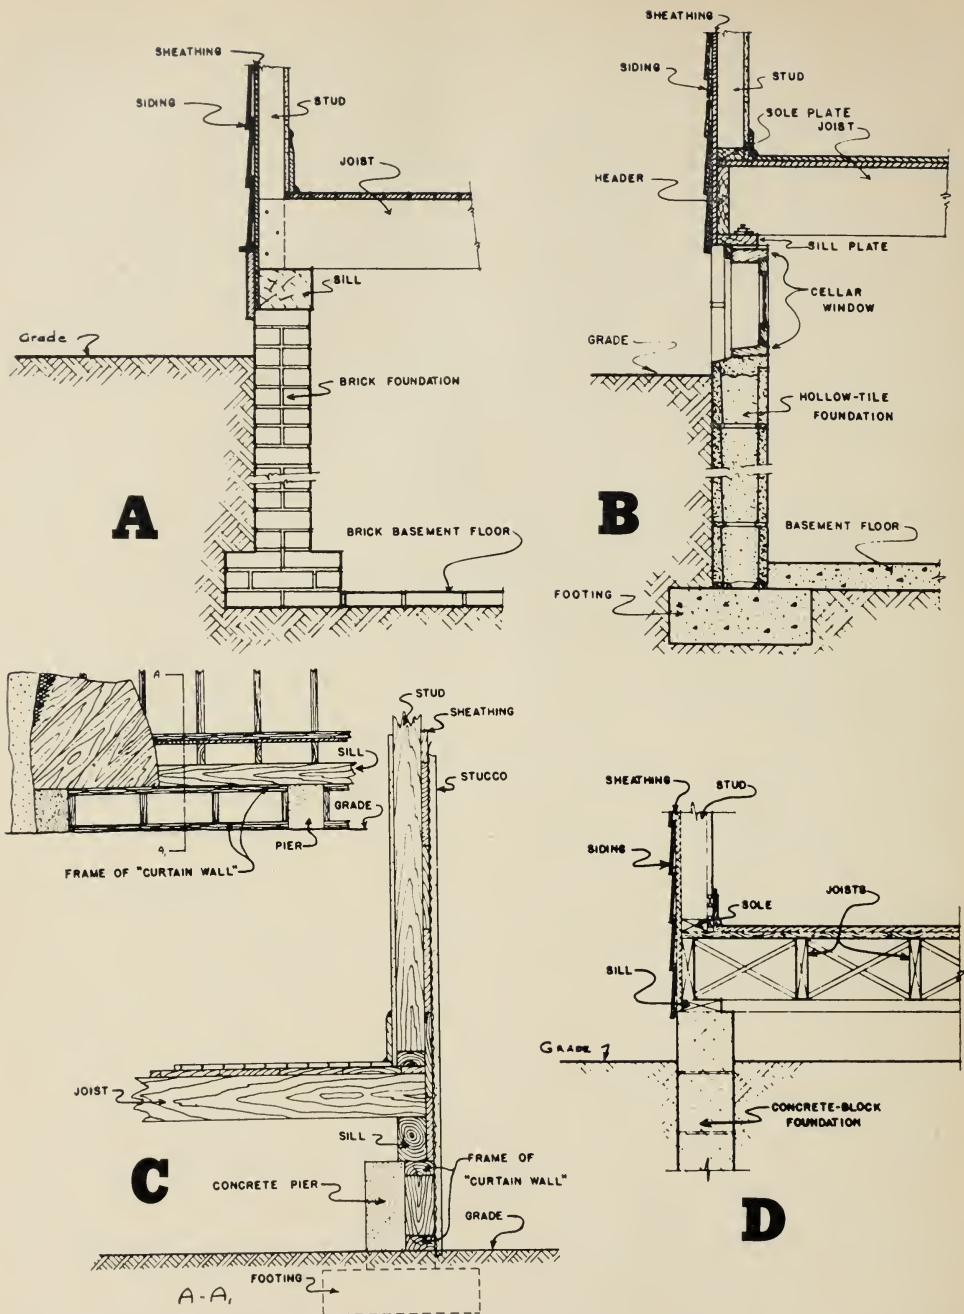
Types of construction: A, brick foundation and brick basement floor; B, concrete-block foundation with cellar window; C, wood framing between concrete piers supporting stucco-frame building; D, sills close to grade on unexcavated house. (From Heal, 1951.)
